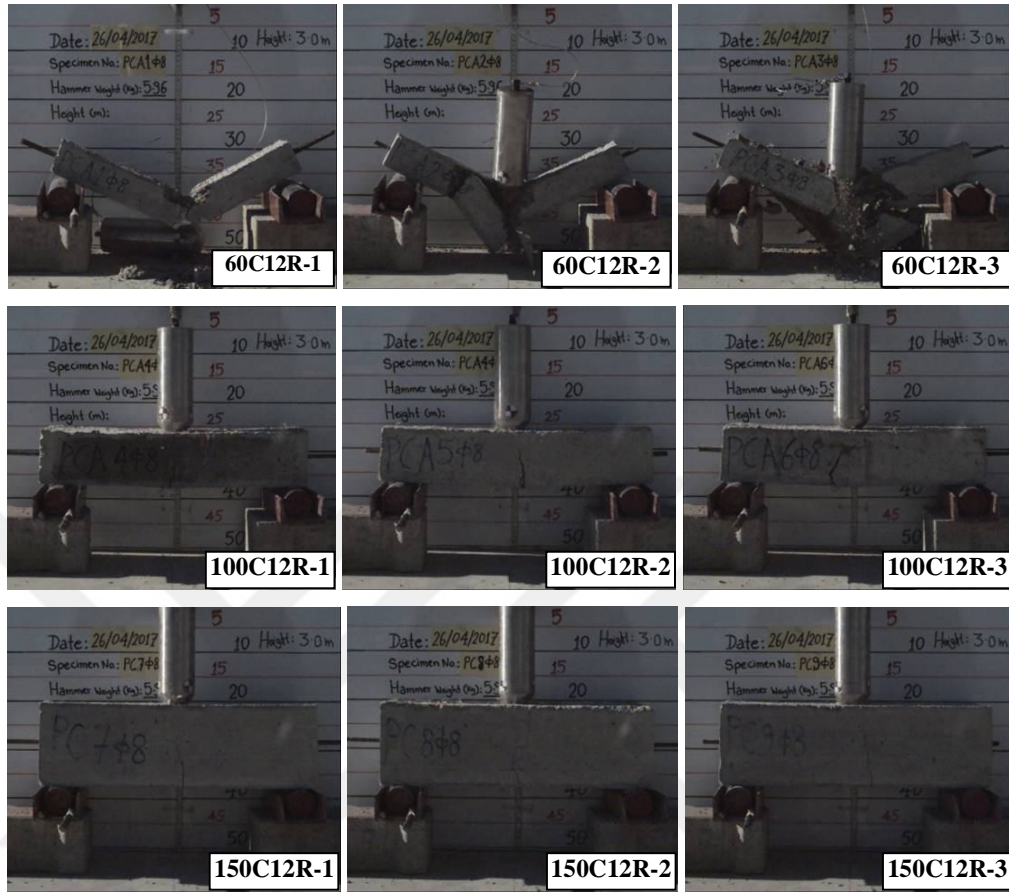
Failure modes of Batch 1 LSC reinforced specimens (Groups 7, 9, and 11)
